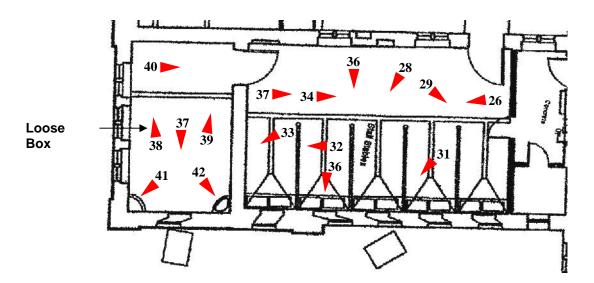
East Range: The Mares' Stalls and Loose Box (North to right)
